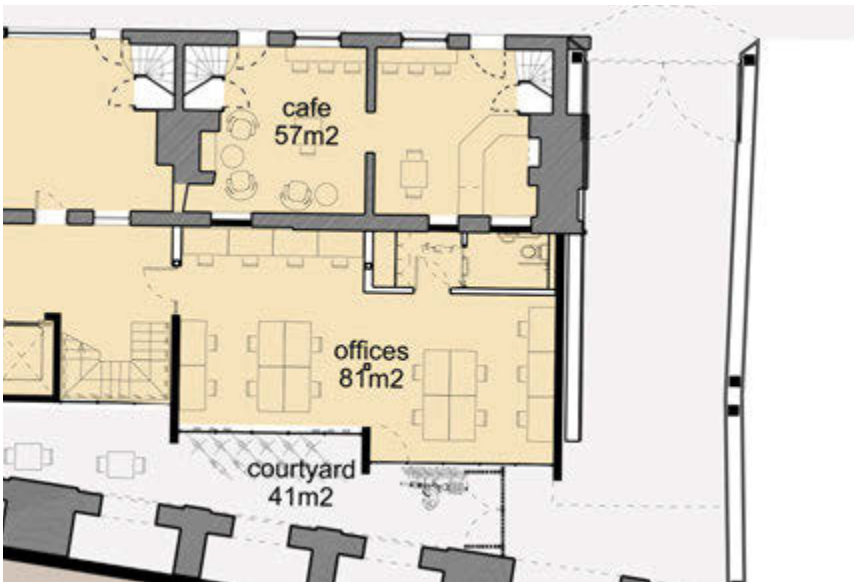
Weavers Cottages - Proposed Ground floor plan
